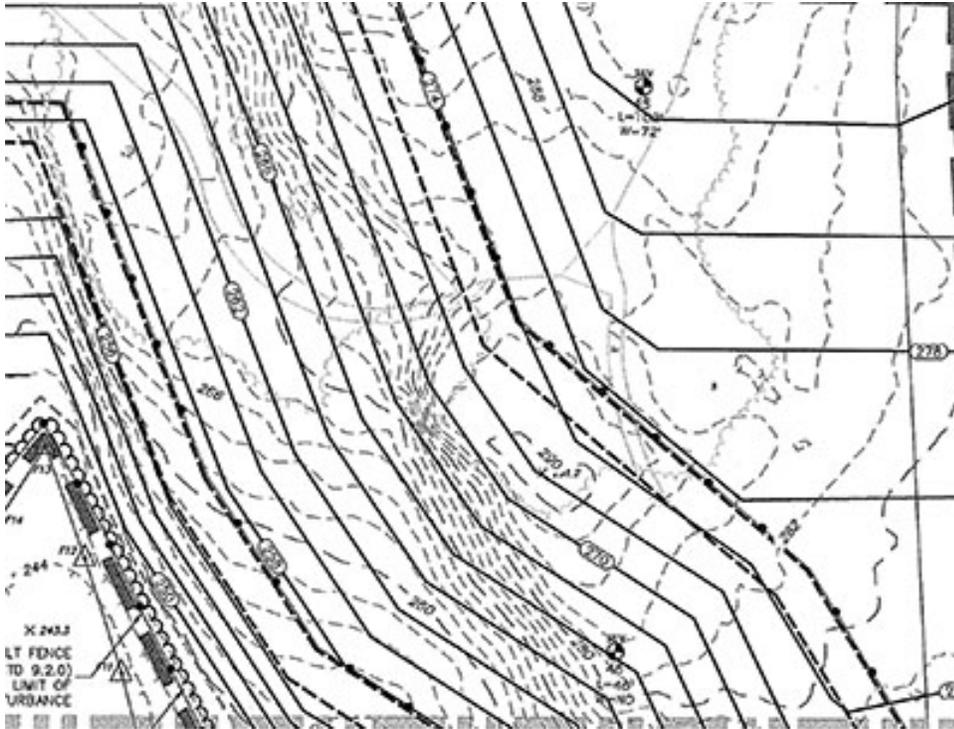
Lippitt Ave Solar grading plan, sheet 6.
